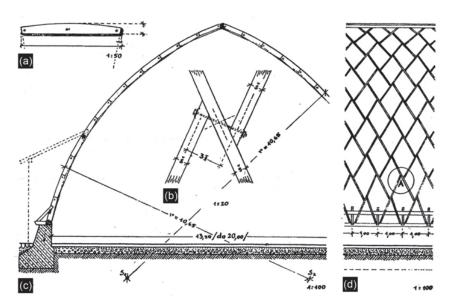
Zollinger lamella roof design: (a) lamella detail with dimensions, (b) joints of lamellae, (c) transverse section and (d) longitudinal section of the roof for housing [6].
